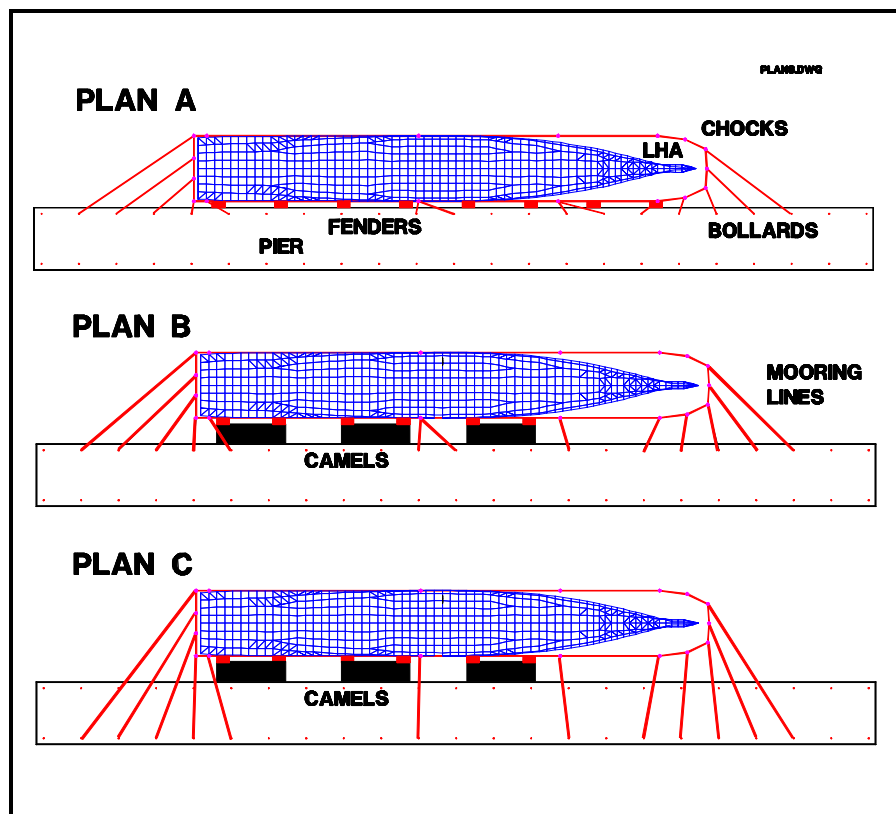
MOORING PLANS CONSIDERED IN THE LHA MOORING EXAMPLE
